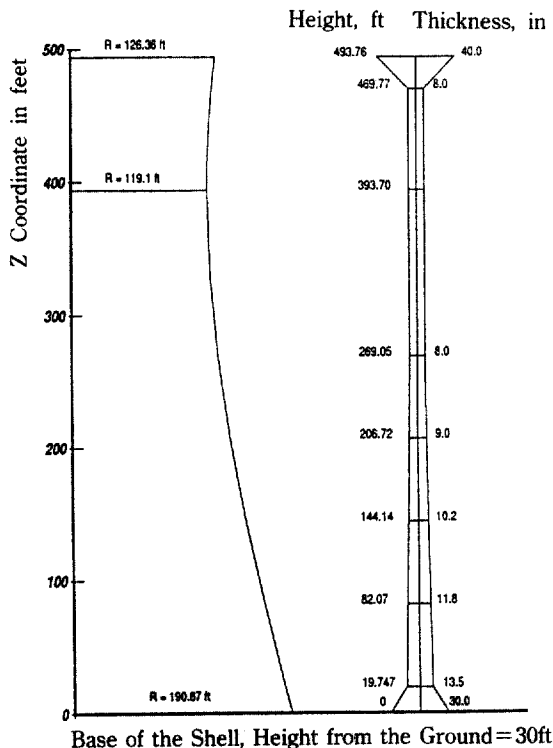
Geometry and wall profile of the Grand Gulf Cooling Tower
